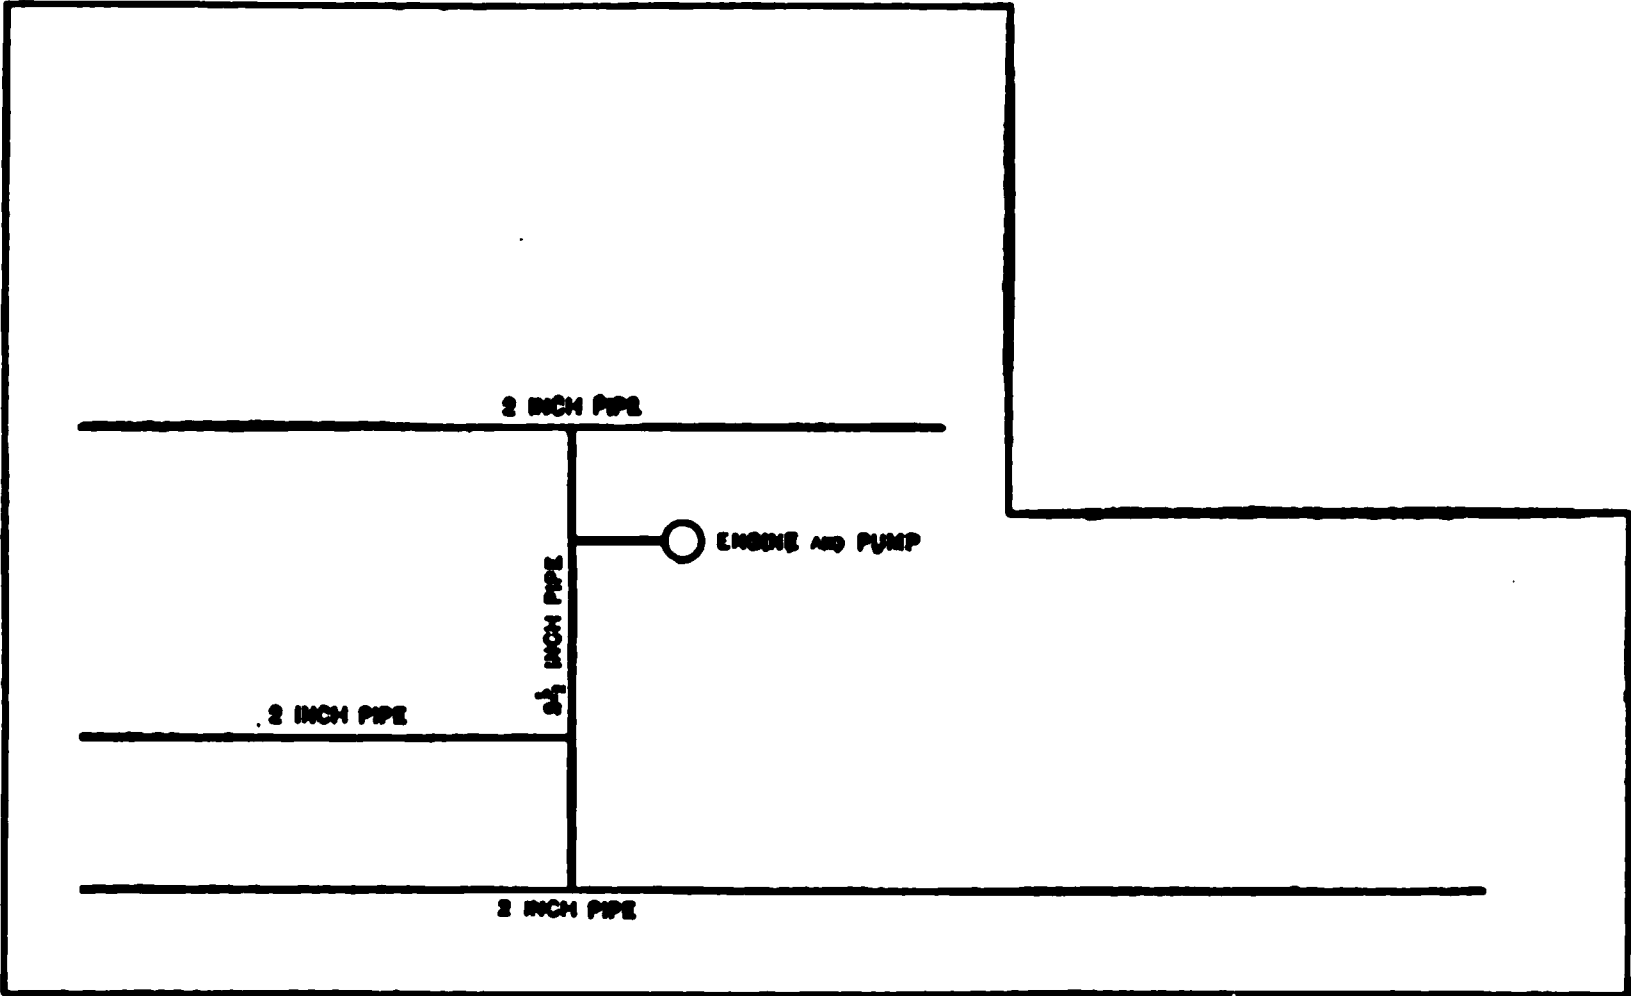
Plan of irrigation plant of W. P. Stokes.
